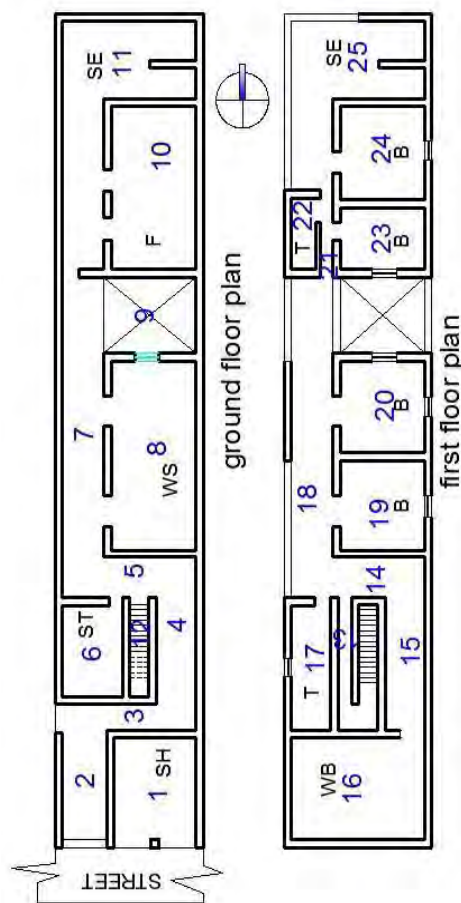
Floor Plan of 64, Shankhari Bazar.
